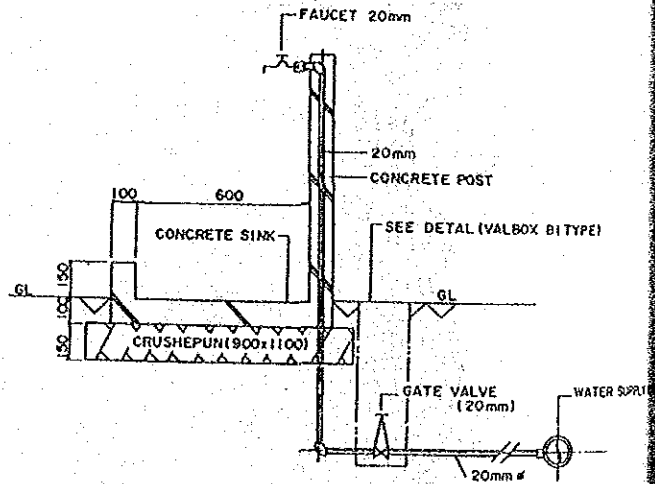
Typical Plan of Rural Water Supply Facilities
